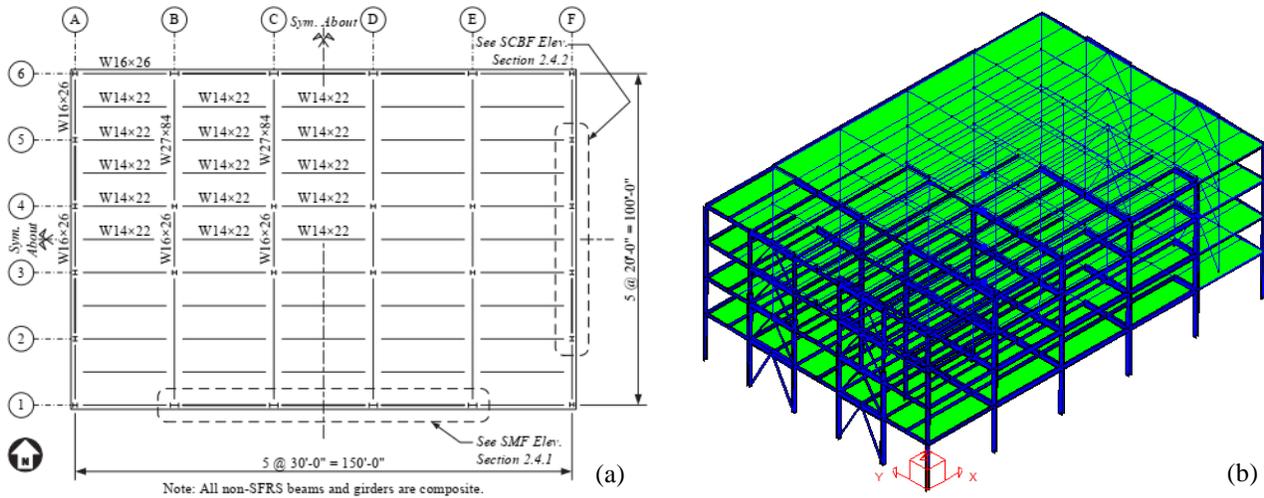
Steel building example: (a) building plan [30], (b) 3D elastic model developed in S-FRAME.
